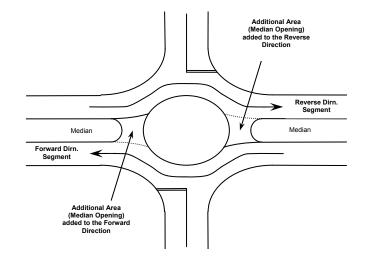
Segmentation Convention for Roundabouts on Divided Carriageways
